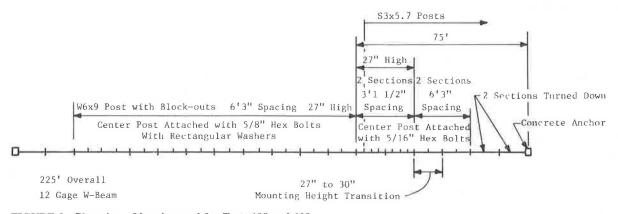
Plan view of barrier used for Tests 108 and 109.
